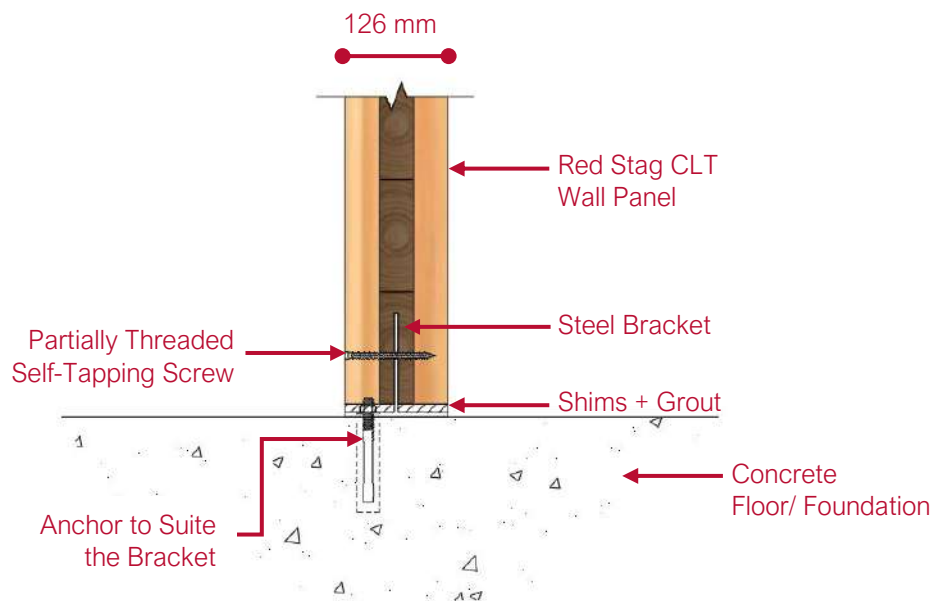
Internal Red Stag CLT wall to the concrete foundation/floor connection.
